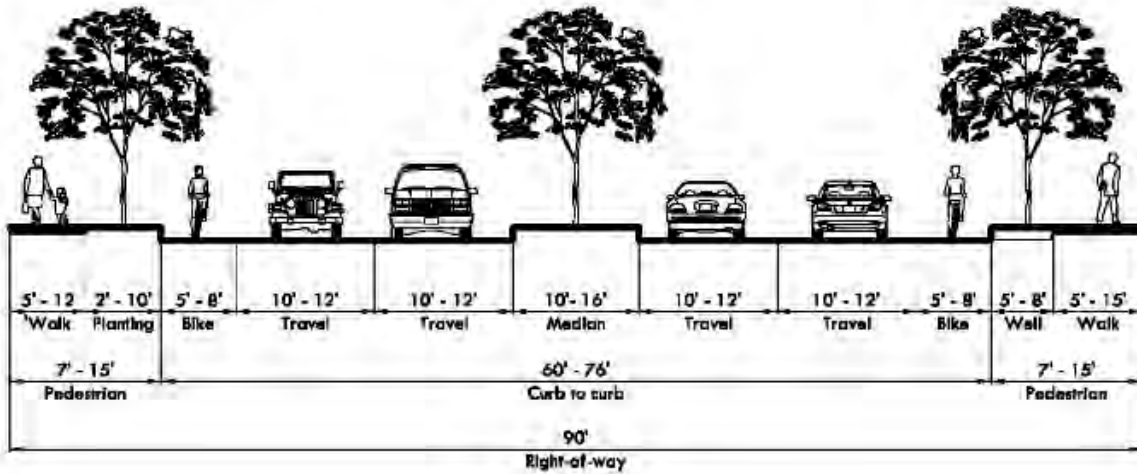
Typical "A" Street with 80'-90' Right-of-Way Section
